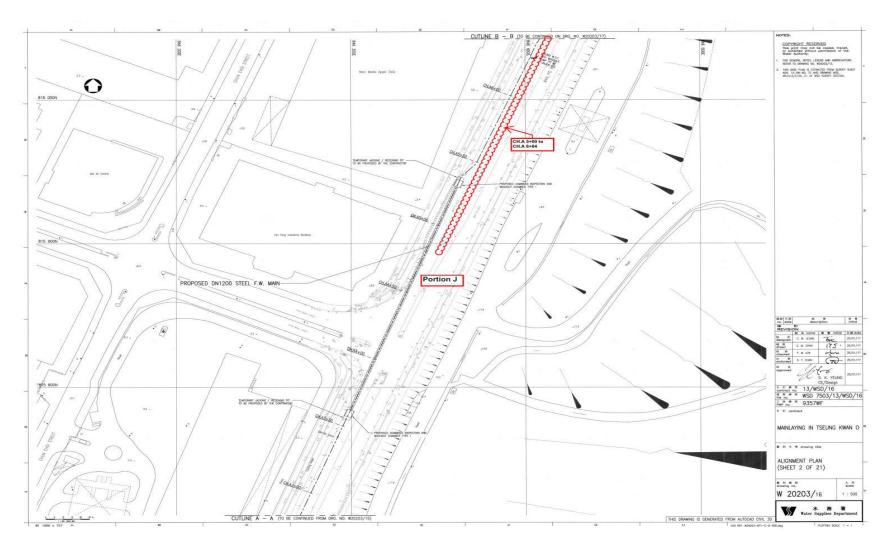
Location Plan for Portion J - CH.A 5+00 to CH.A 6+64
